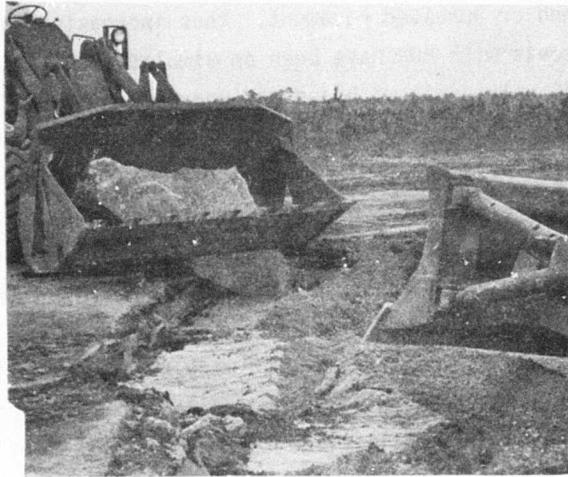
Test 1-1, AC 645 Attempting to Remove Broken and Upheaved Pavement Sections with 4-in-1 Bucket
